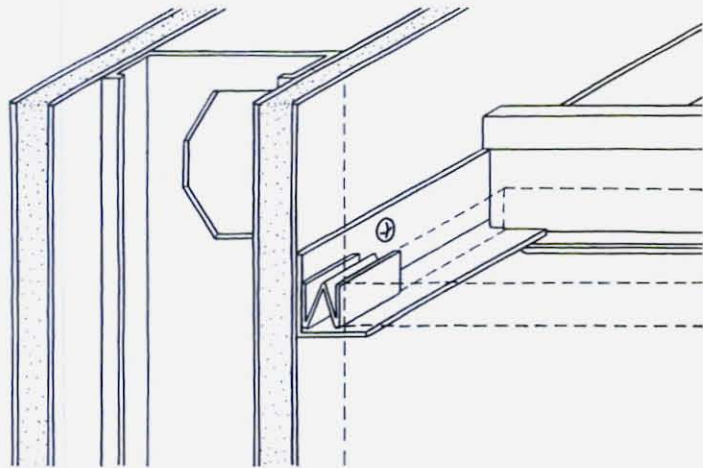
TYPICAL DETAILS OF HYPOTHETICAL BUILDING SECTION.
